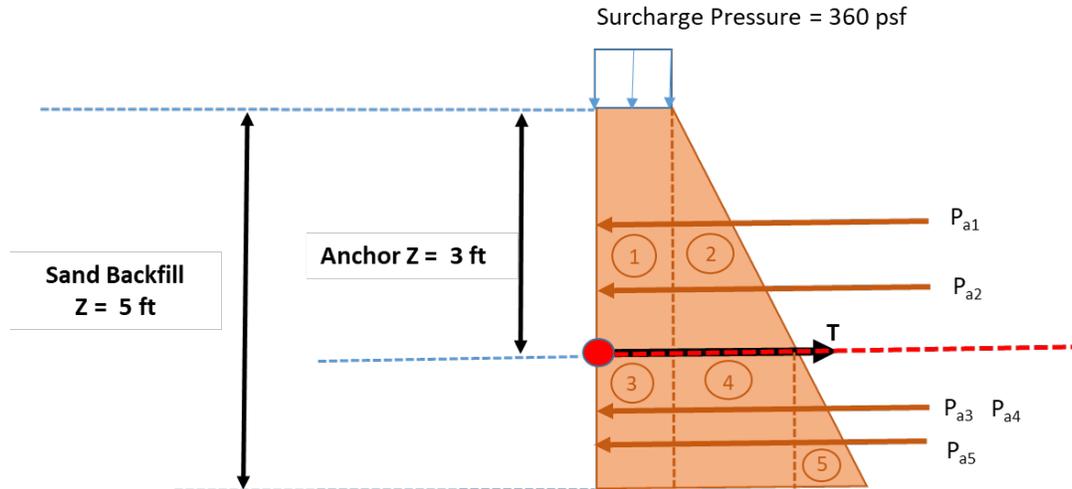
Case 5 Active pressures and forces acting on the sheet pile wall from the backfill.
